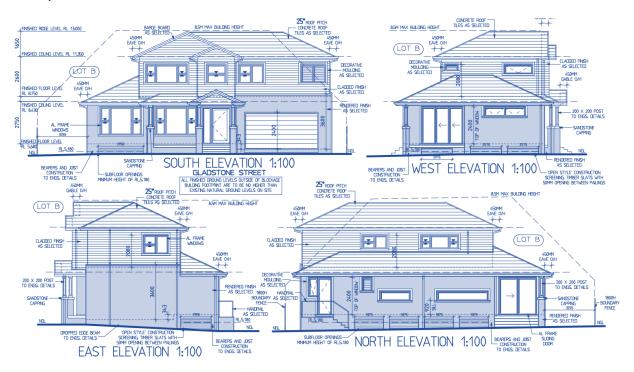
Extract from the approved architectural plan set showing the elevations for Dwelling B (Gladstone Street)
